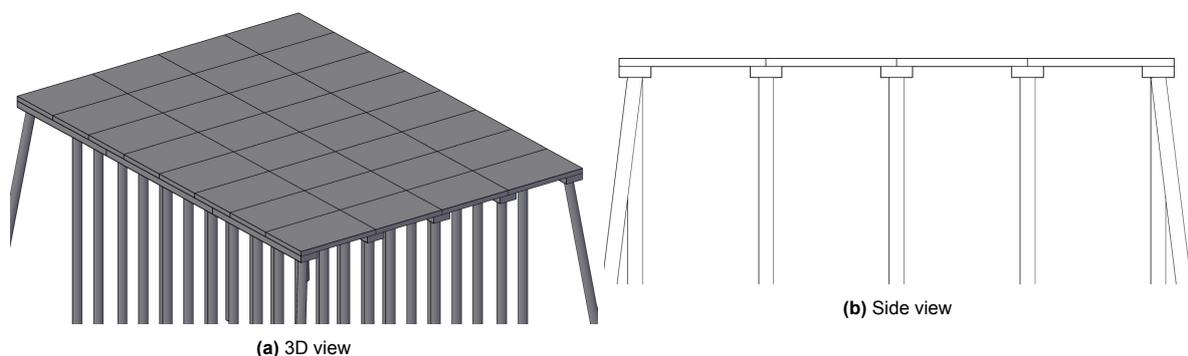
Layout of variant 1: Separate rib plates and deck plates
